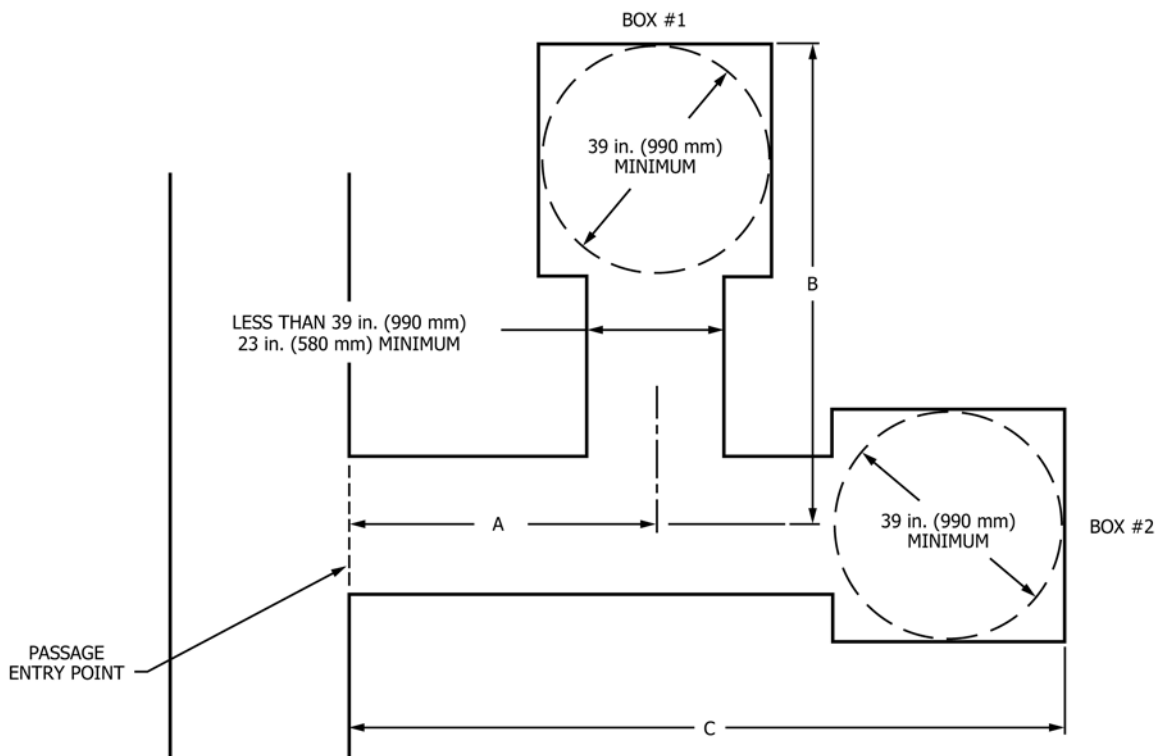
Dead Ends With Less Than 39 in. (990 mm) Cross Section With Turnaround Overhead View
